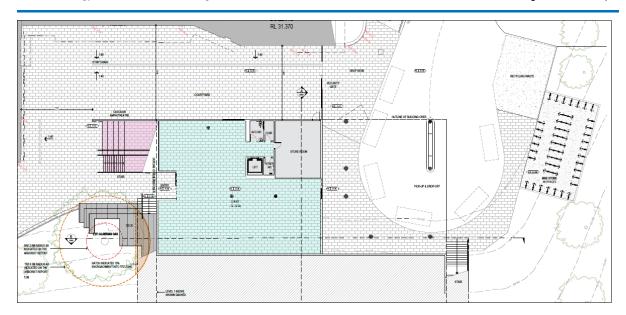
Proposed Ground Floor layout including pick up and drop off zone
